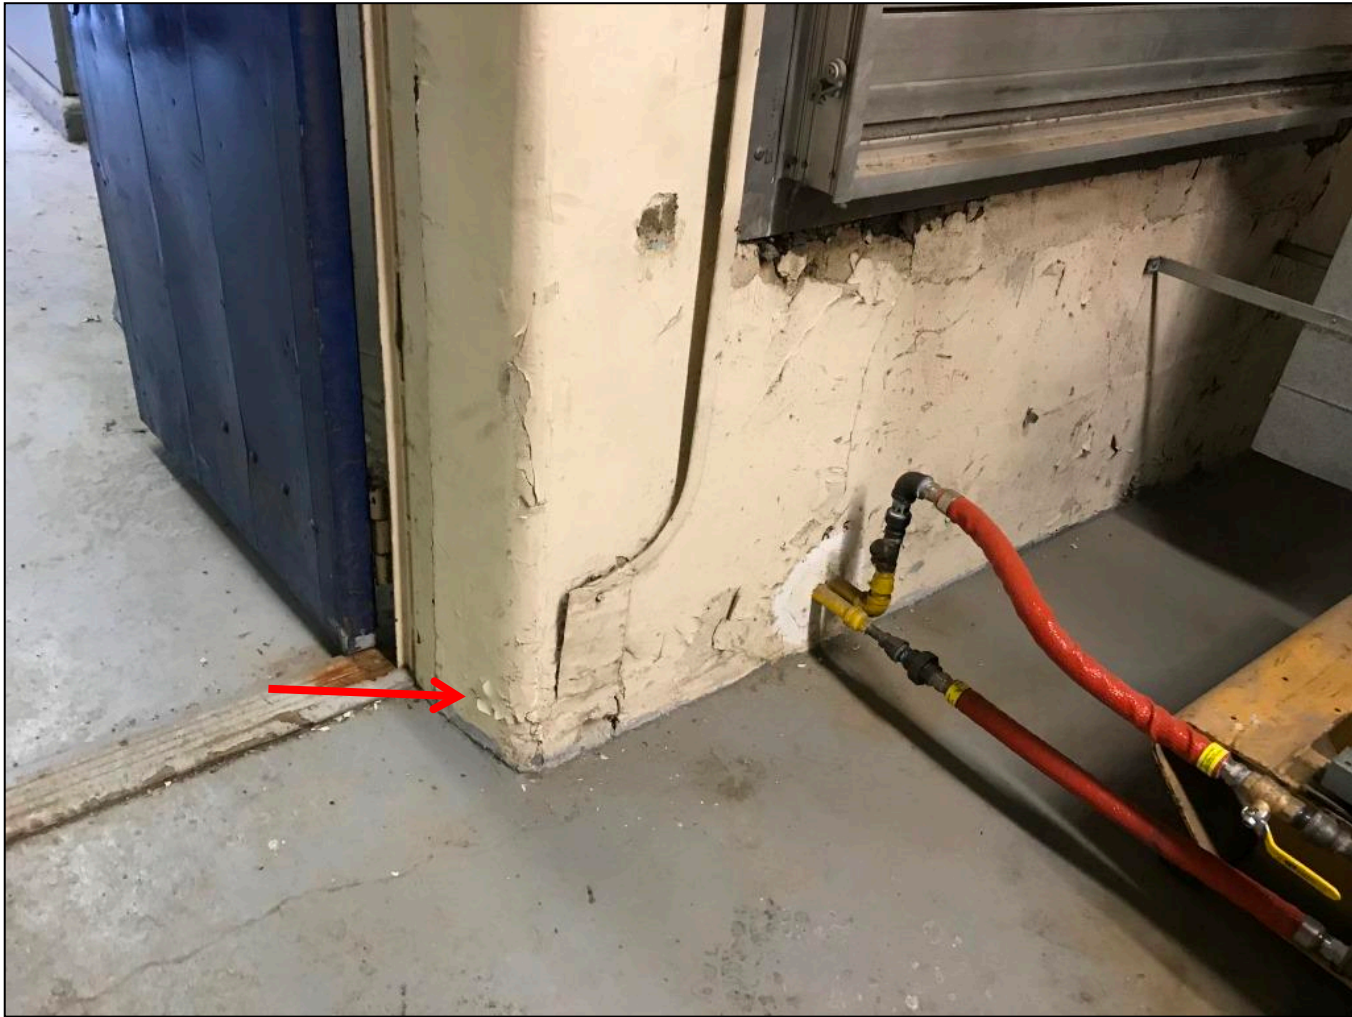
Main Floor, Room 110 – Beige Paint (Lead Containing)
